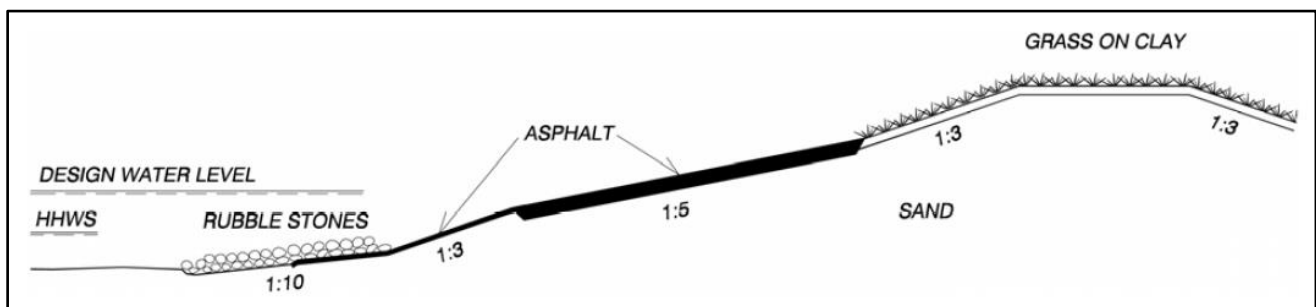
Example cross Section of an armoured sea dike (Source: USACE 2006)
